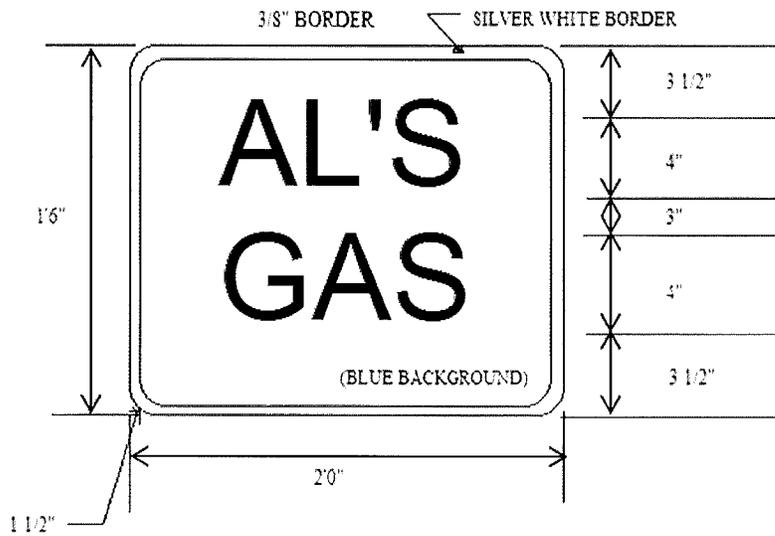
TYPICAL EXIT RAMP LOGO SIGN DETAIL
